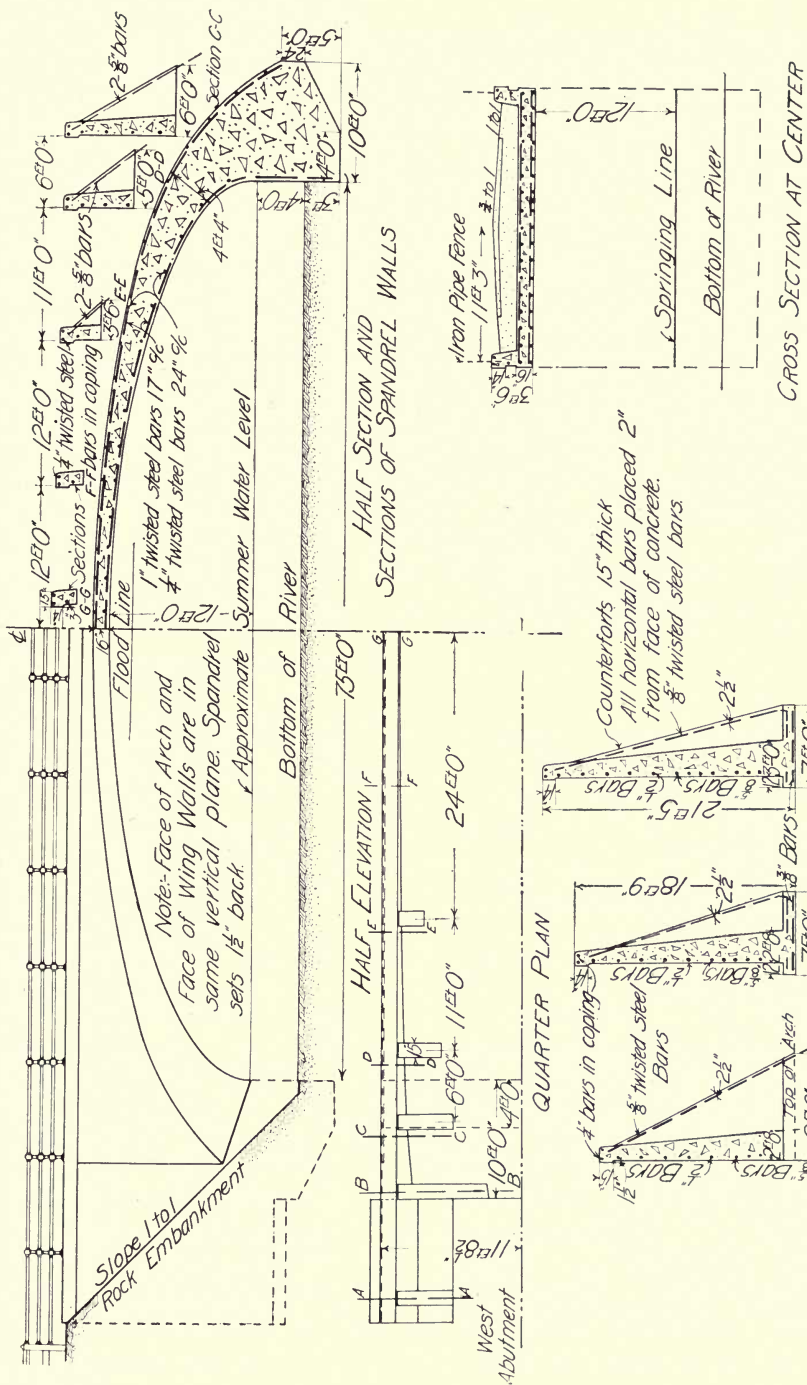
ARCH BRIDGE WITH SPAN OF 75 FEET, ELM STREET, CONCORD, MASS.
